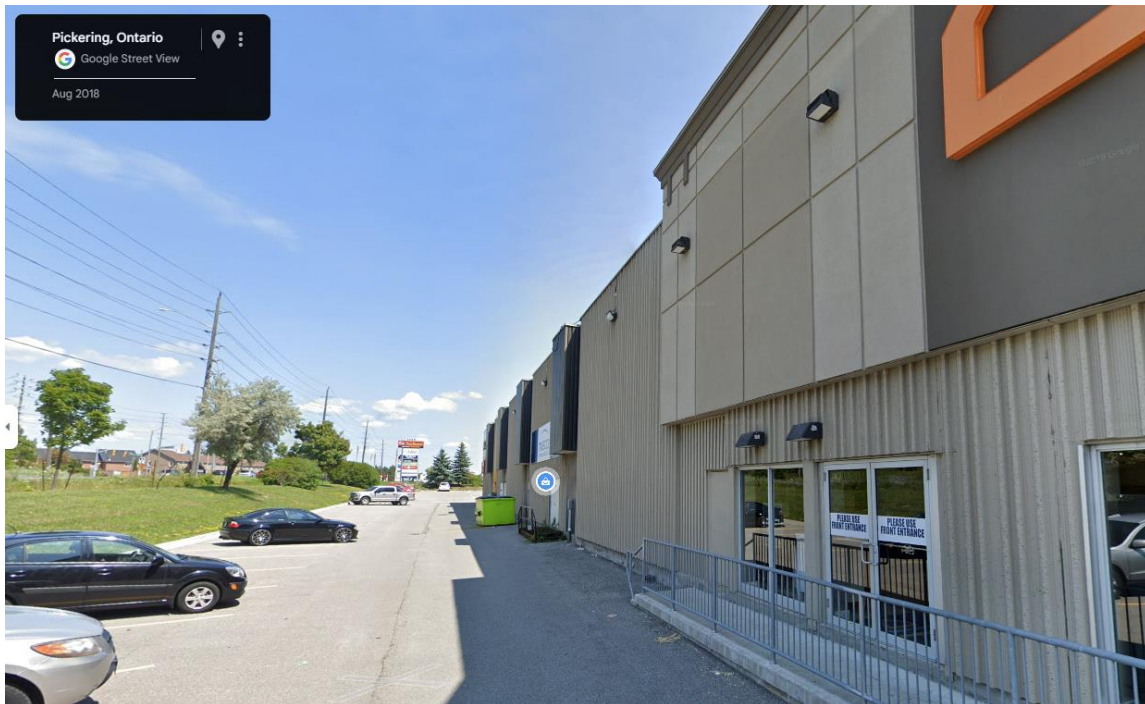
View of the proposed Development Parcel from 1095 Kingston Road looking North (Google Street View)
